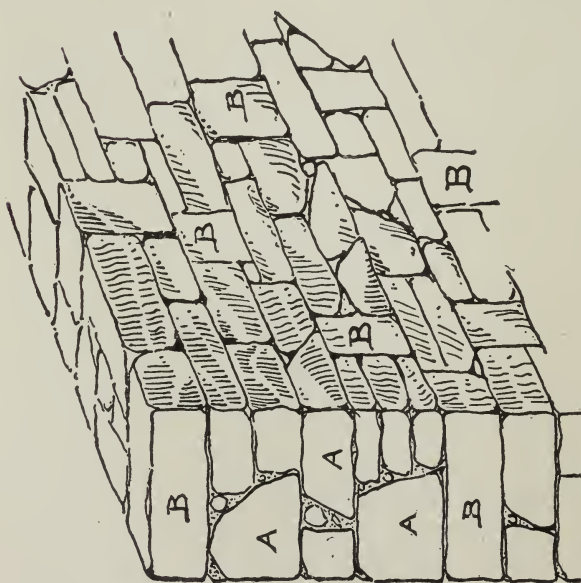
Rubble Stone Wall Showing Bond-Stones.
